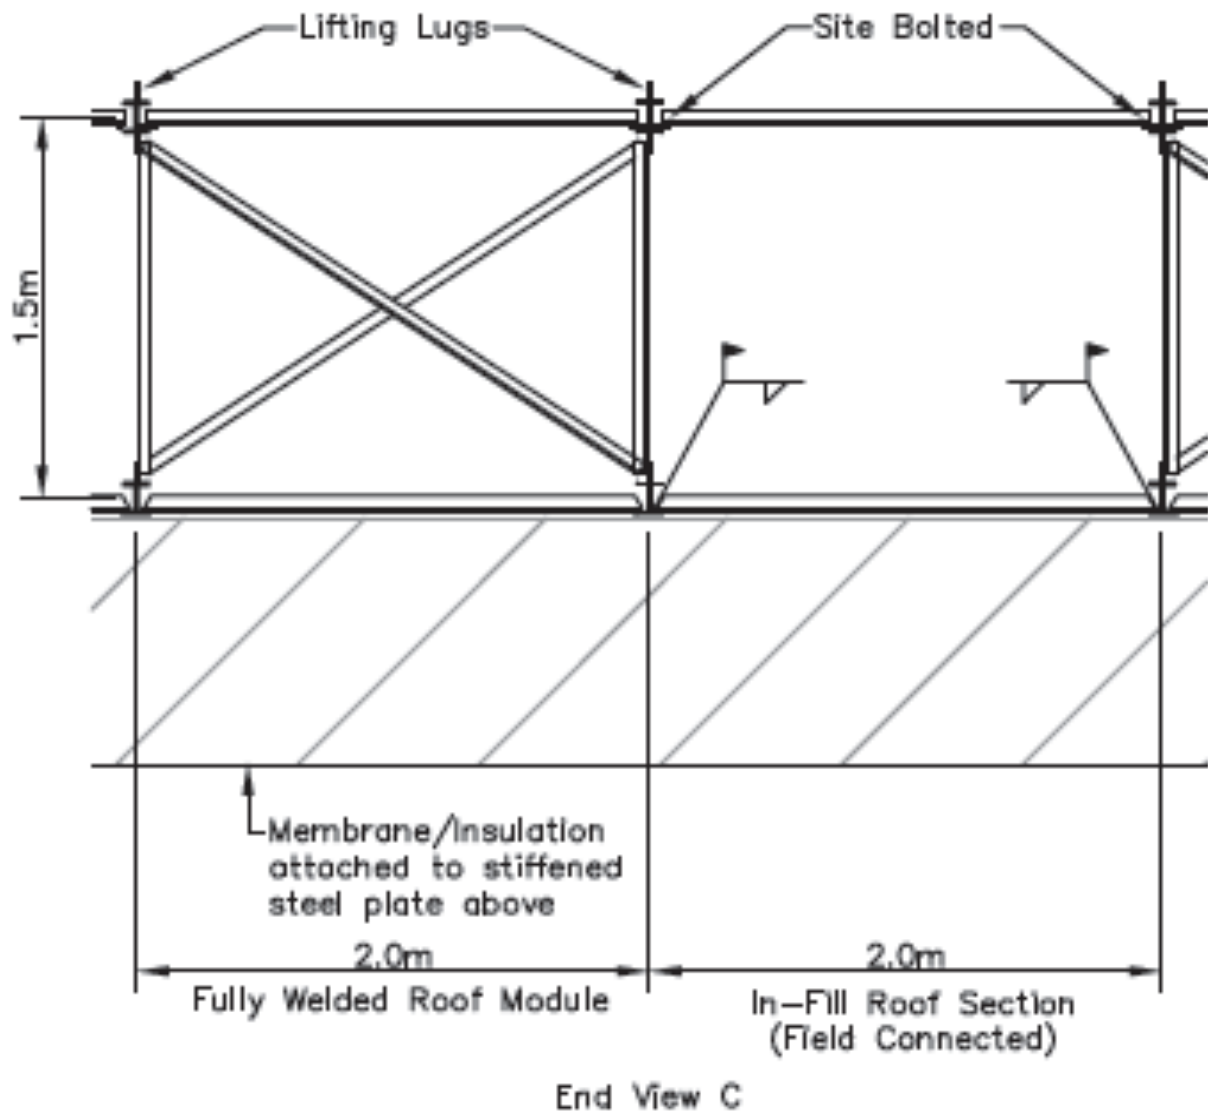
Steel roof truss with lower steel plate FIXME: need arrow to steel plate
